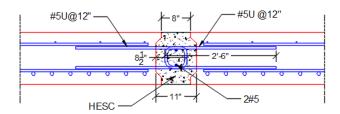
Proposed alternatives of non-prestressed precast concrete approach slabs
